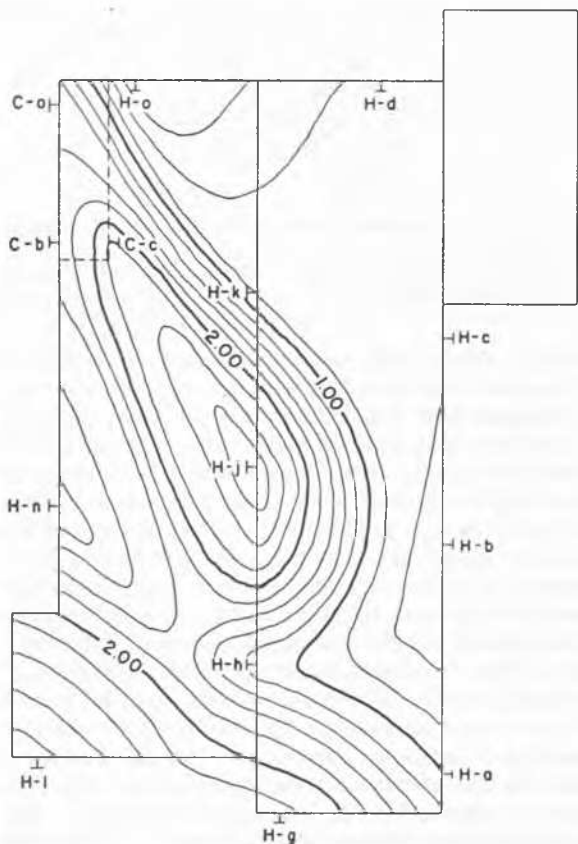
House No. 5. Elevation Contour July 25, 1952. Contour Interval: 0.20 in.
